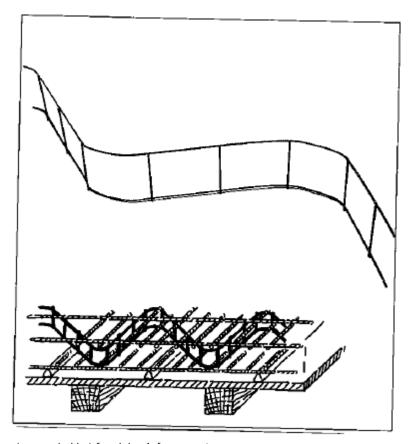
Spacers (mouse ladder) for slab reinforcement
